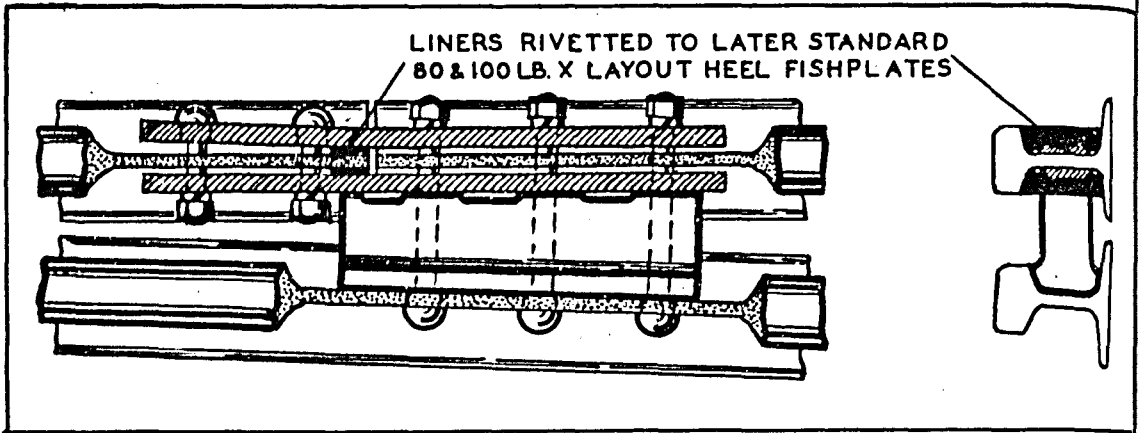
TYPICAL 60, 80 & 100 LB. X LAYOUT HEEL
